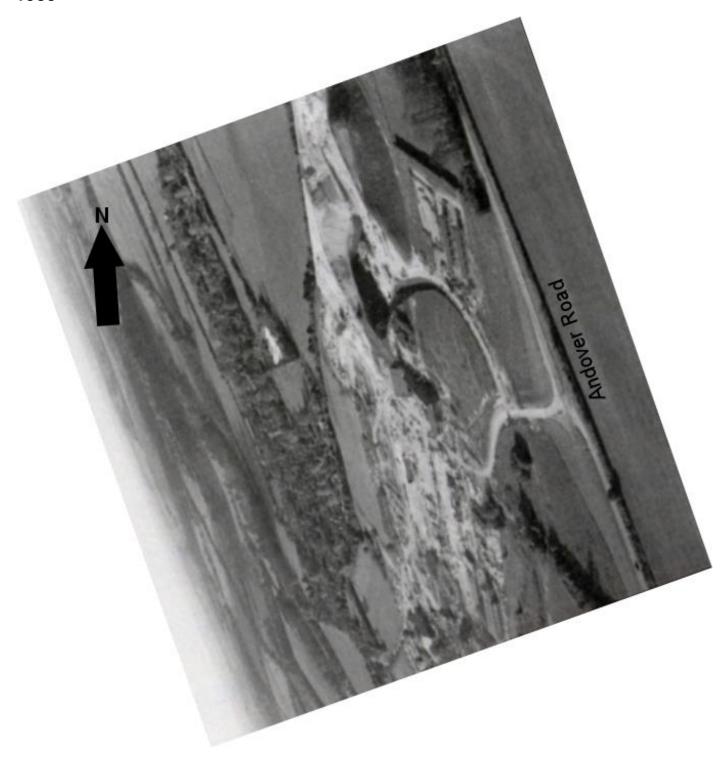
1983 Aerial photo of the Sir John Moore Barracks Construction site under construction
